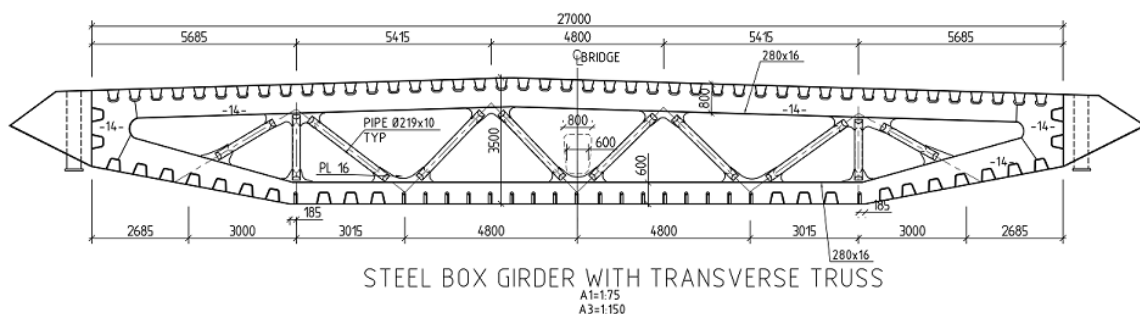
Steel bridge girder – layout of transverse truss diaphragm spaced 4.0 m
